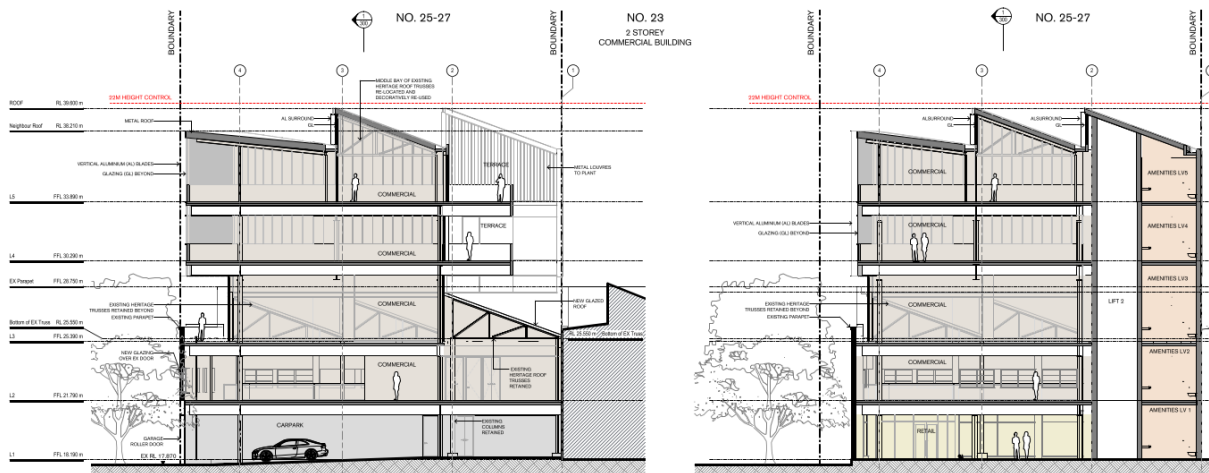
Proposed Section Plan 2 and 3 looking west through the building
